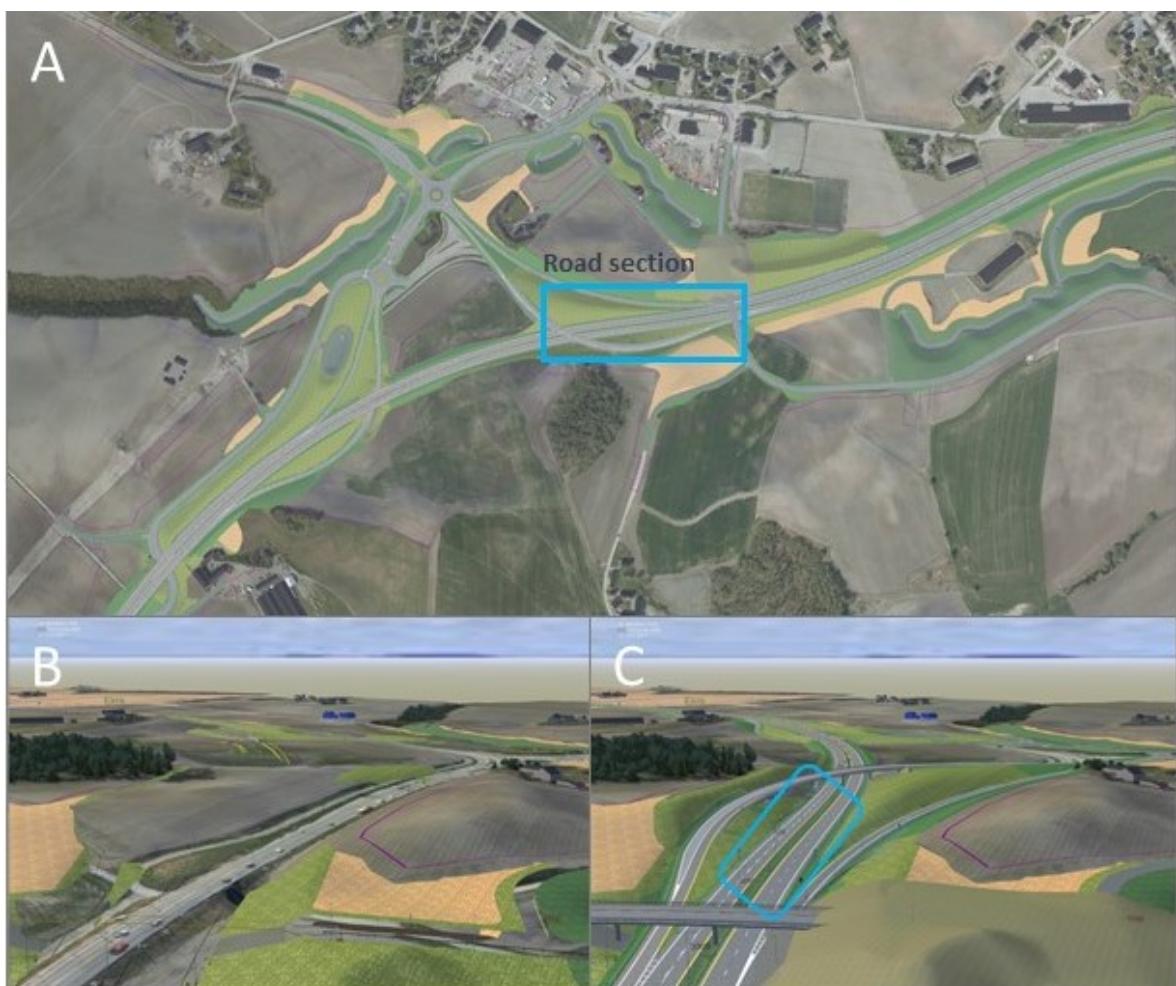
Road section for quantification. A) Overview picture, road section for applied MFA. B) Old road infrastructure at same road section. C) Road infrastructure post construction.
